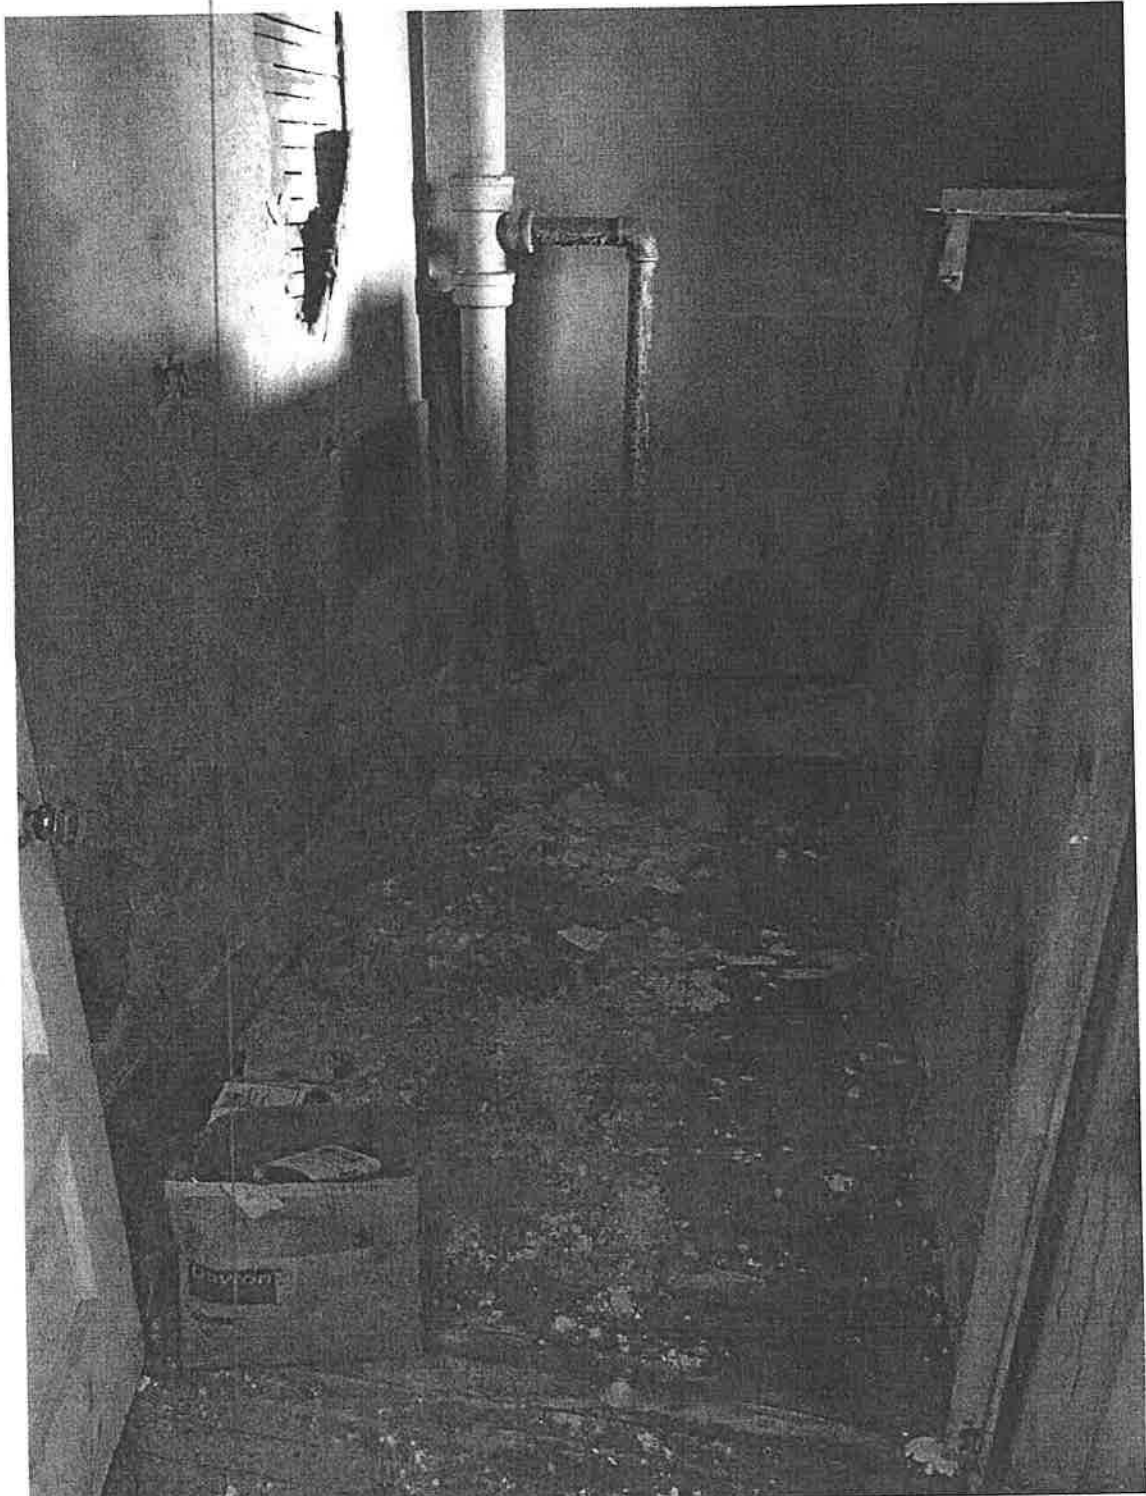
Moisture damaged, soft flooring at 2nd Floor. Note wall/ceiling plaster failure and debris.
